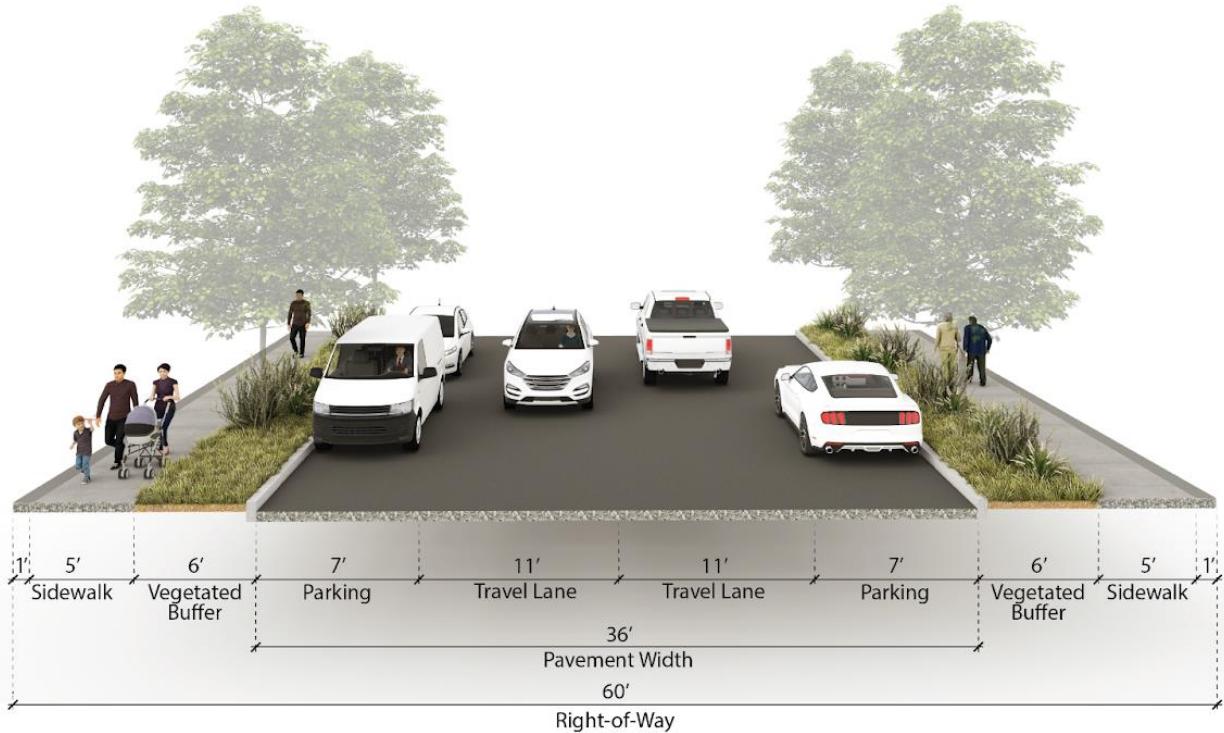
Cross-section for Urban Local Street – Standard Residential Street
